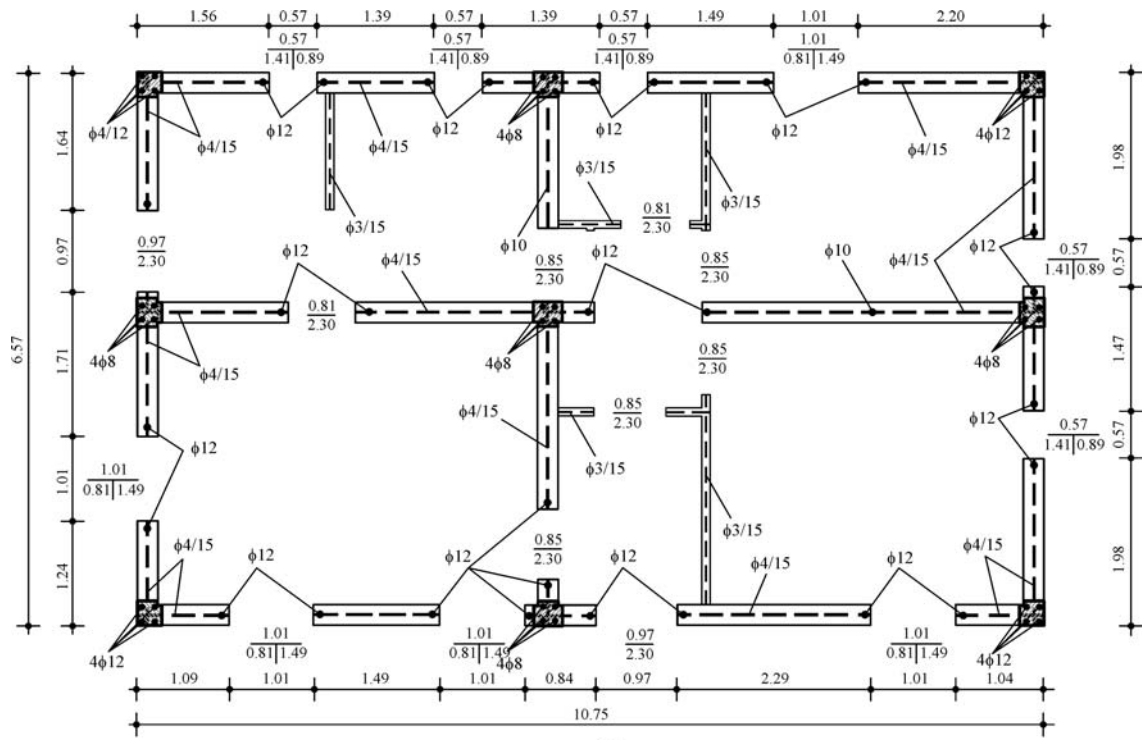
Structural print with plan view of the buildings of concrete units masonry depicted in Fig. 4
